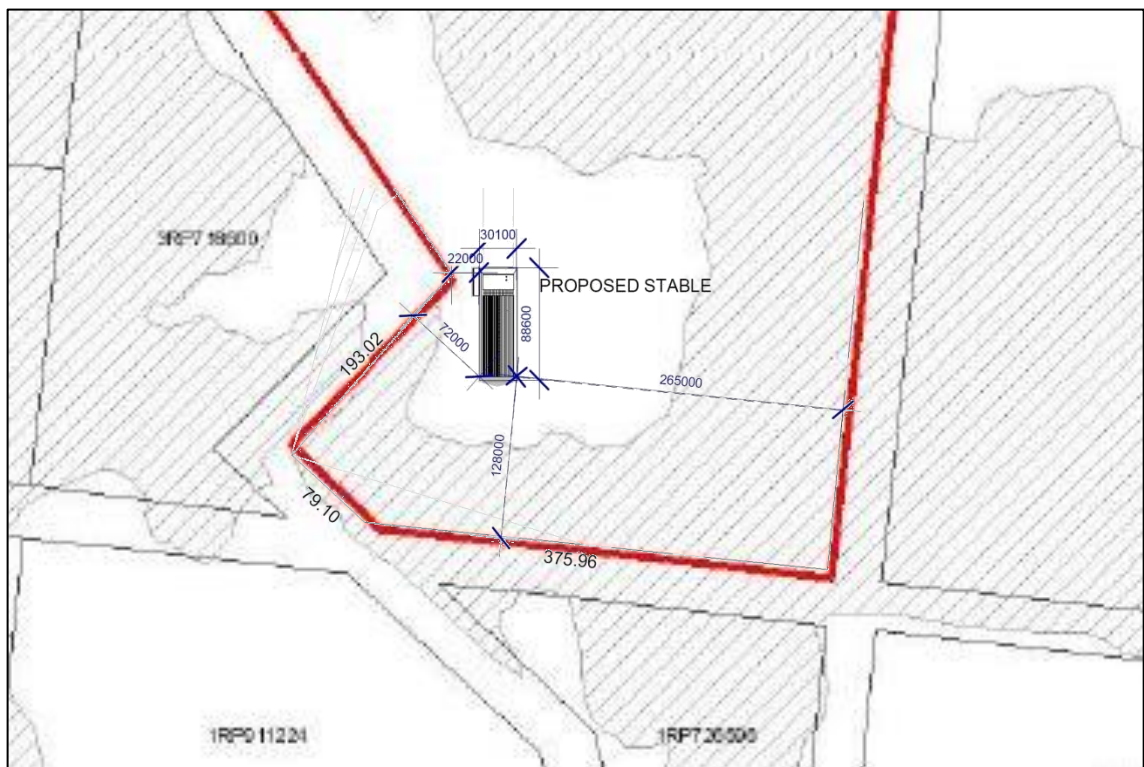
Proposed facility siting on vegetation mapping. (Studio 111/DAMS)
